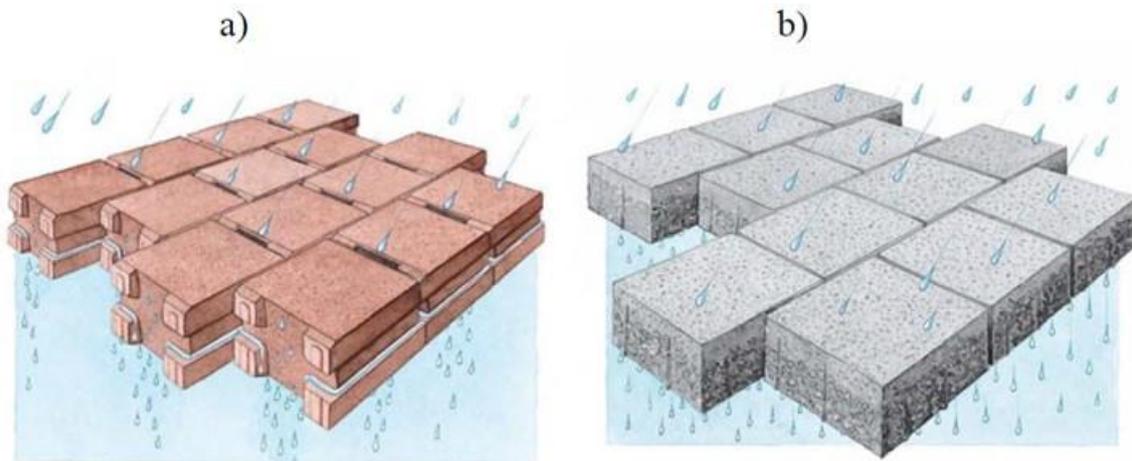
SYSTEMS OF PERMEABLE PAVEMENTS: A) PAVERS WITH CANALS AND B) POROUS PAVERS
